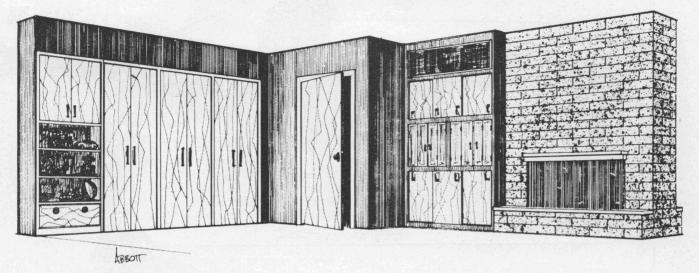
Family room perspective, showing fireplace, door to hall and storage units.
